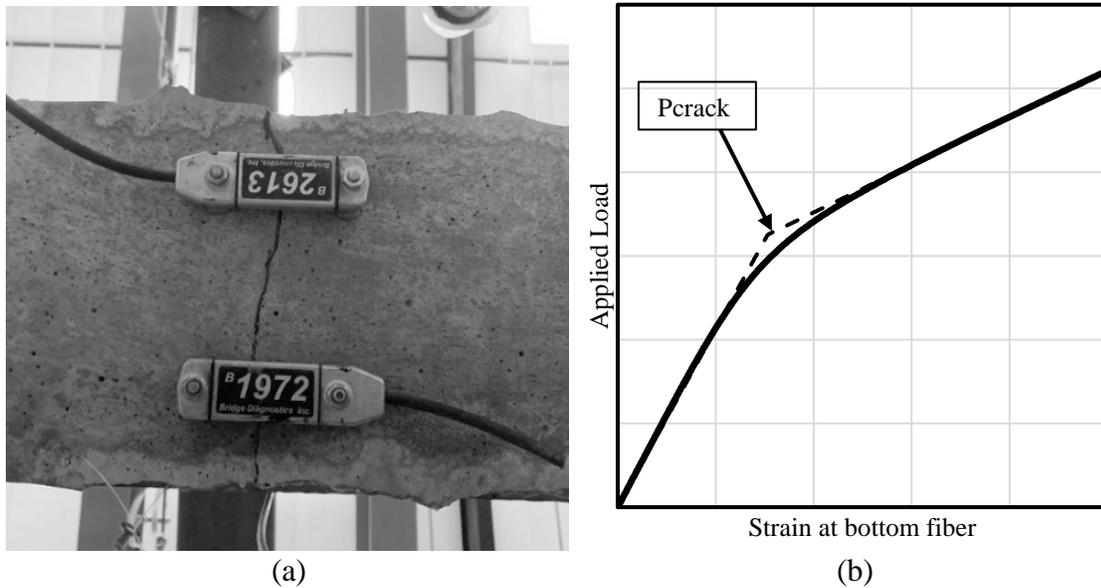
Illustration of the possible cracking load on a prestressed beam
